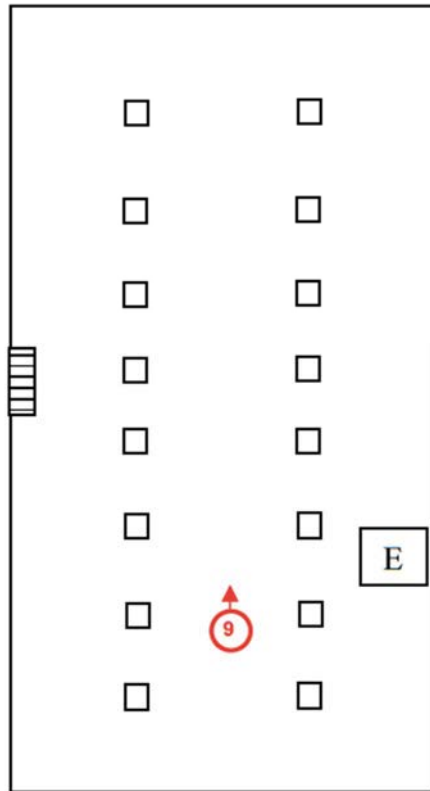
Key to photographs, interior, 2<sup>nd</sup> floor
